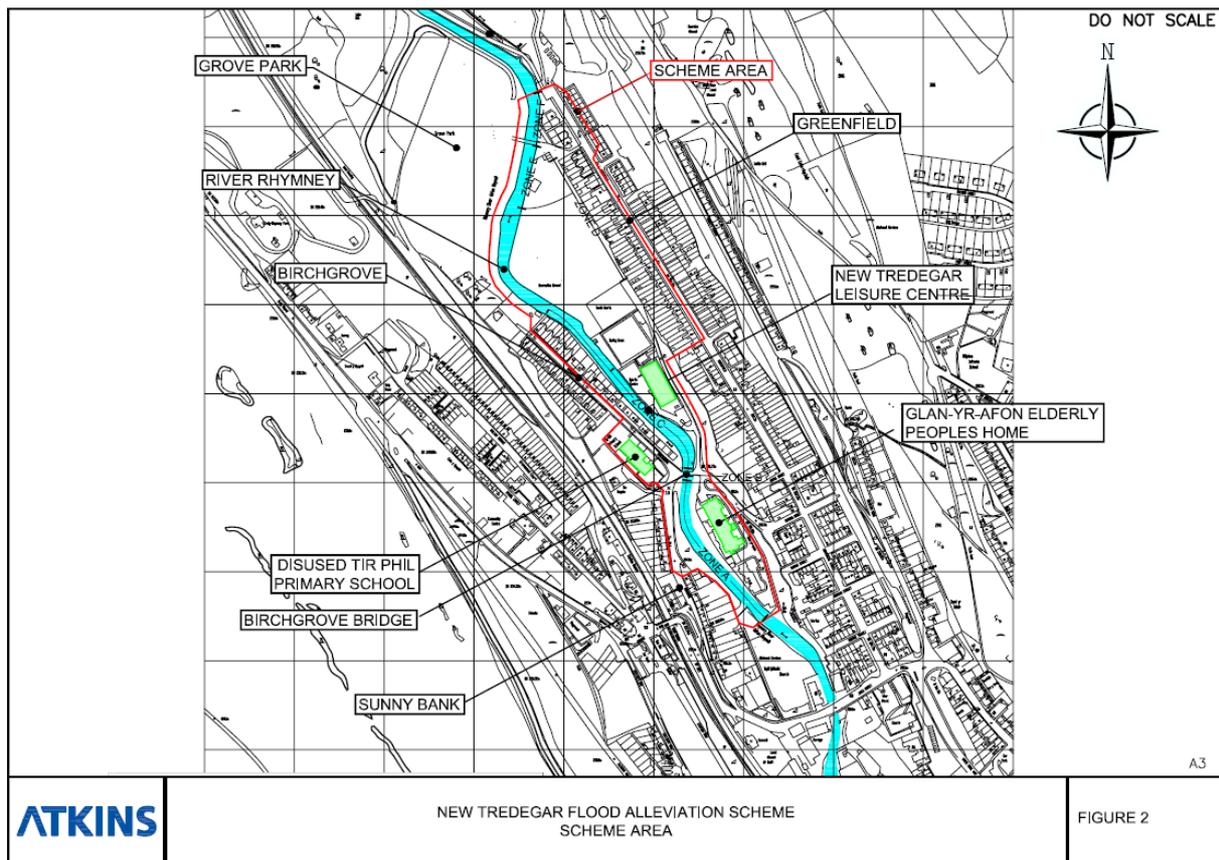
New Tredegar Flood Alleviation Scheme; Scheme Area
